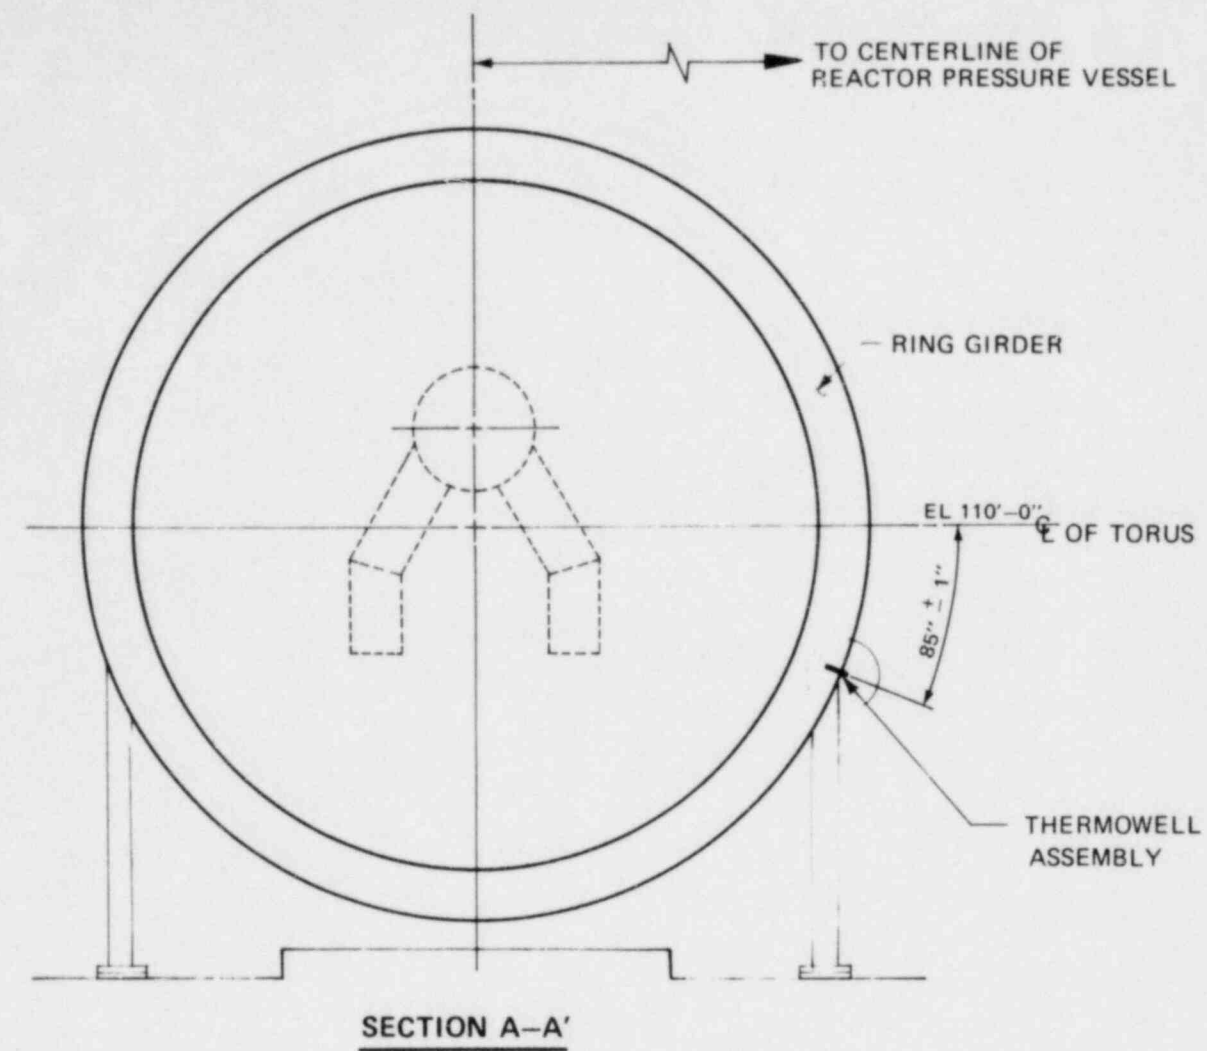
SECTION AND DETAIL FOR THERMOWELL ASSEMBLY
